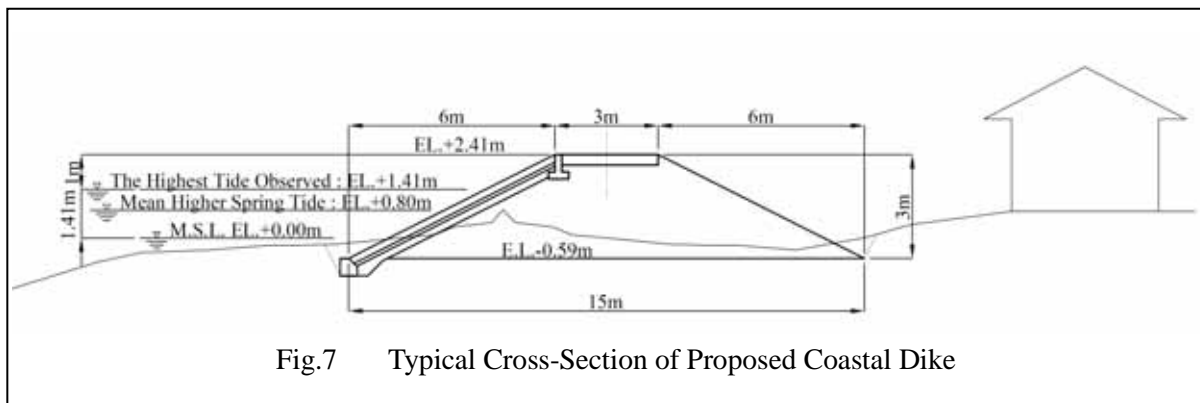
Typical Cross-Section of Proposed Coastal Dike
